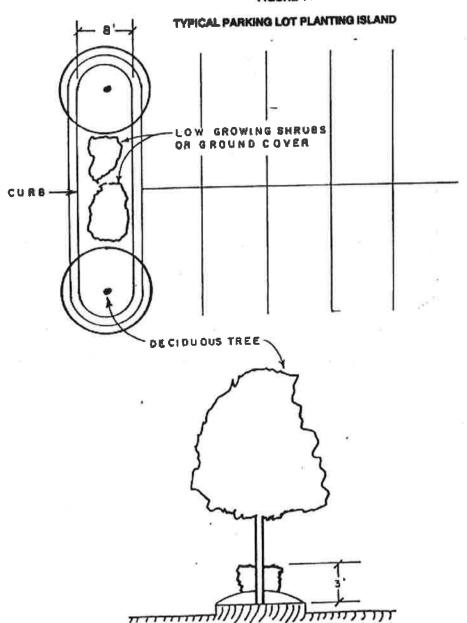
TYPICAL PARKING LOT PLANTING ISLAND
